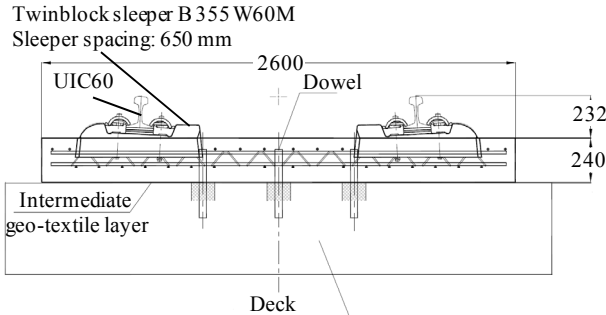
Cross-section of Rheda 2000 ballastless track used on the Hollandsch Diep Bridge (in millimetres). Adapted from [14]
